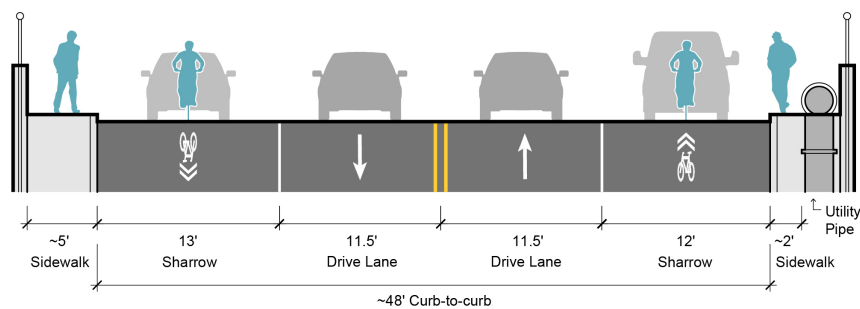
Dorchester Avenue / Haul Raod Bridge Existing Cross Section
